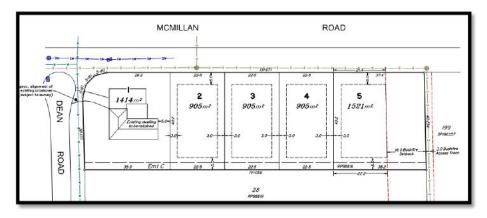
Proposed subdivision plan provided by DTS (consultant) for pre-lodgement discussions
